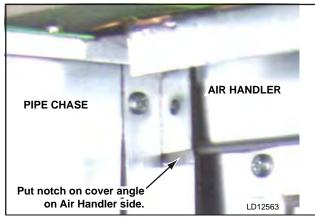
PROPER POSITIONING OF COVER ANGLE WITH NOTCH ON AIR HANDLER SIDE
